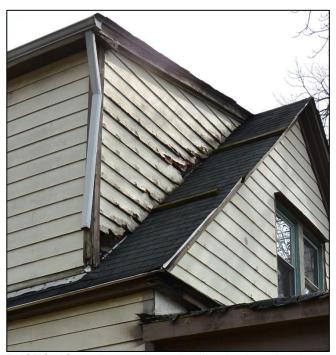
Decayed wood siding, back-up framing, and poor flashing and drainage features.
